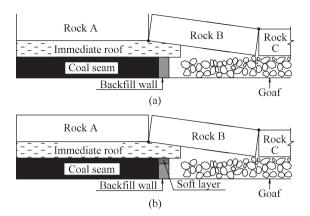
Structure of rock surrounding backfill wall. (a) Ordinary backfill wall. (b) Backfill wall with soft layer structure.
